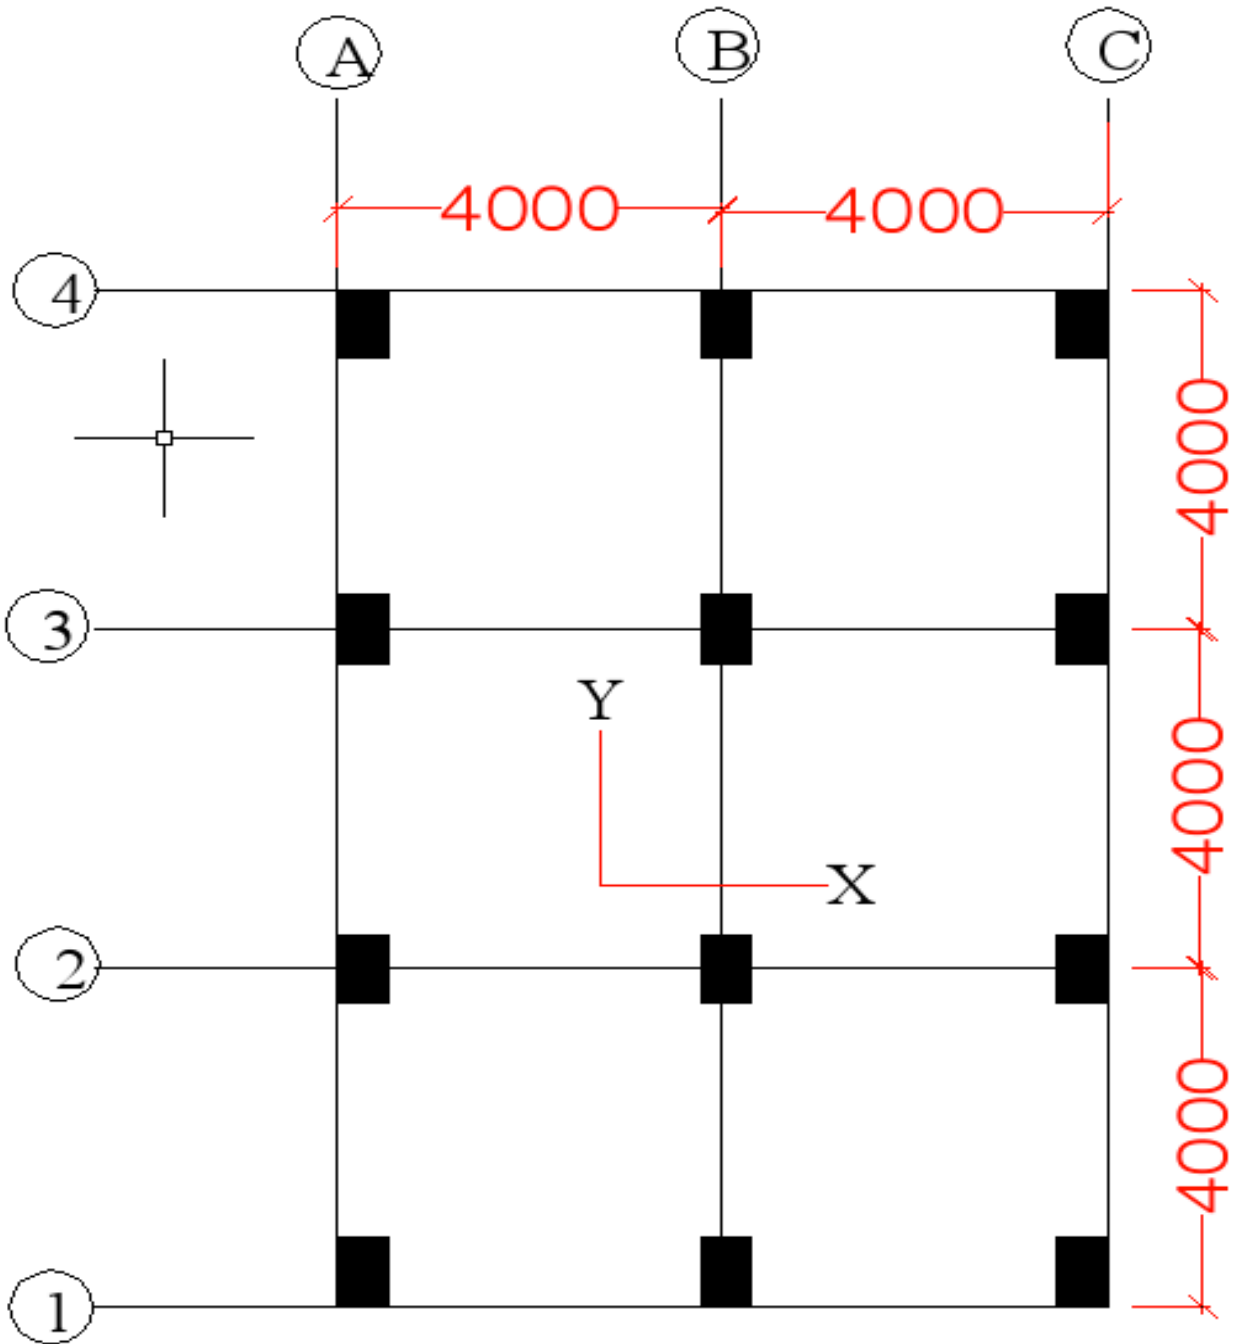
PLAN SHOWING LOCATION OF COLUMN FOR SHEAR FORCE AND BENDING MOMENT (ALL DIMENSIONS IN MM)
